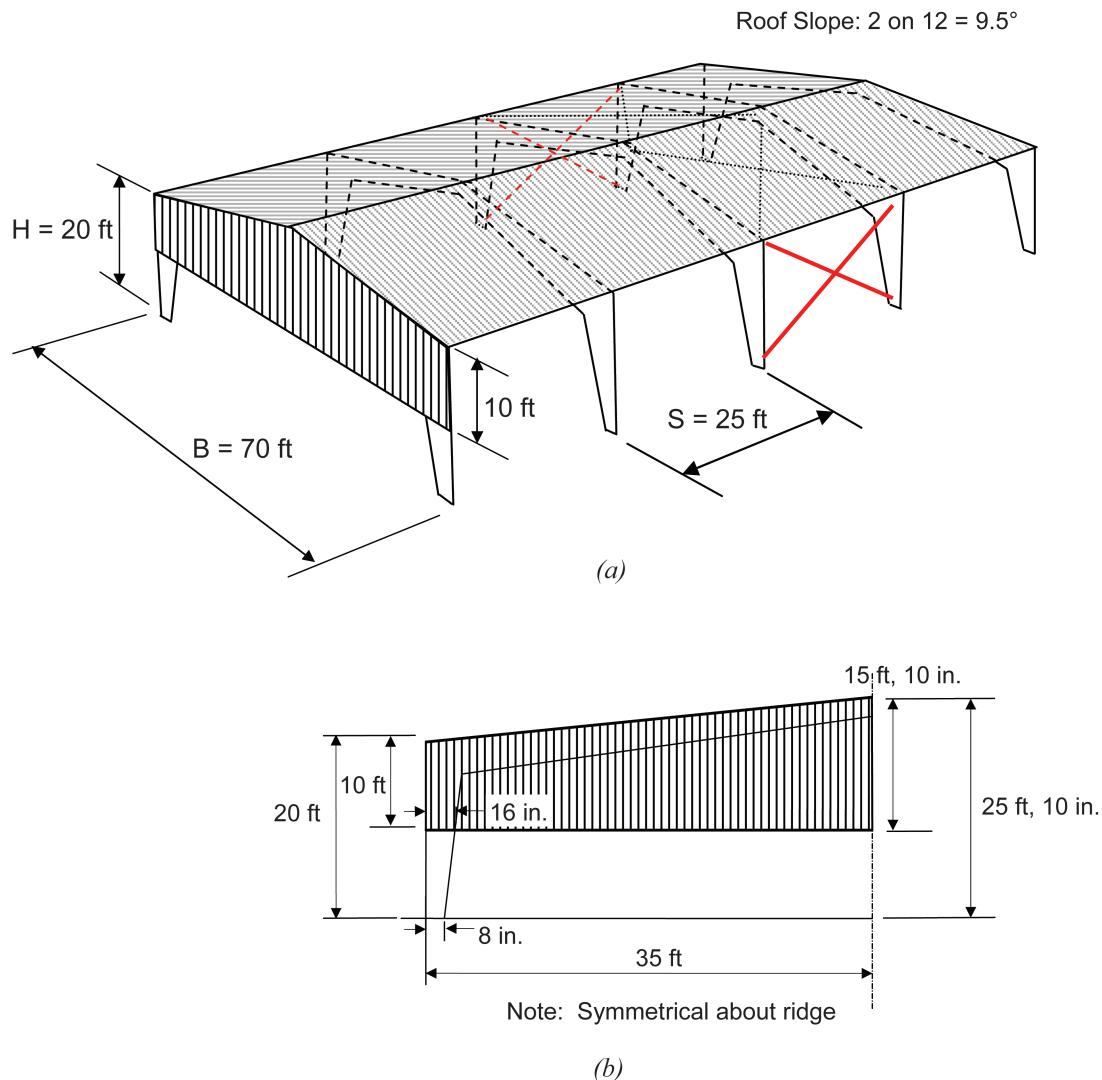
Design example 2: (a) building layout; (b) end wall cladding.
